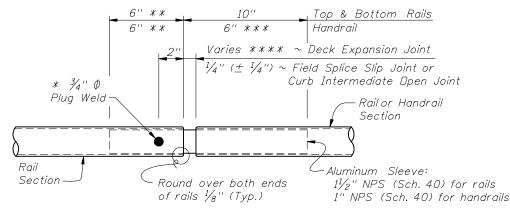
DETAIL "A" — SECTION AT INTERMEDIATE OPEN JOINT
